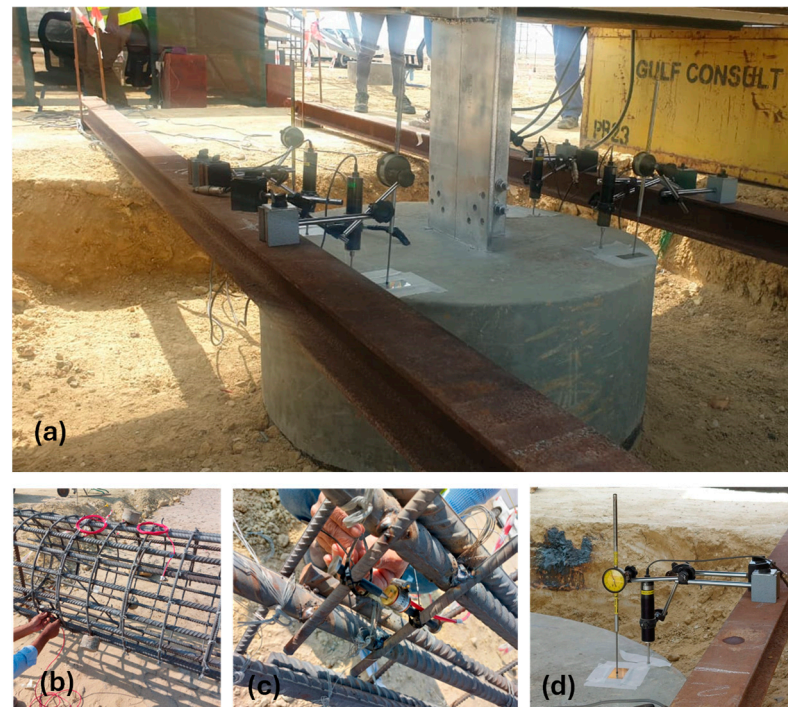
Photos taken during the piles' construction and testing: (a) pile in preparation for the test, (b,c) preparation of pile reinforcement and strain gauge installation. (d) LVDT placed on the pile head.
